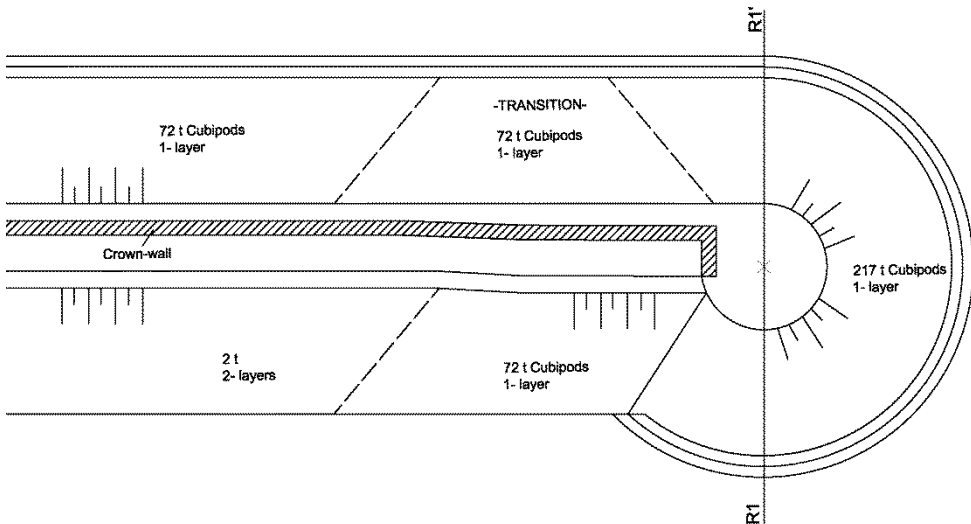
Plan view of the transitions for a single-layer Cubipod[®] armored roundhead.
